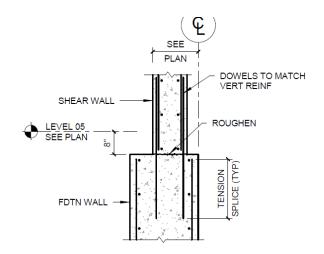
Shear Wall-to-Foundation Wall Connection (Sheet S-2.11 Detail 9)
